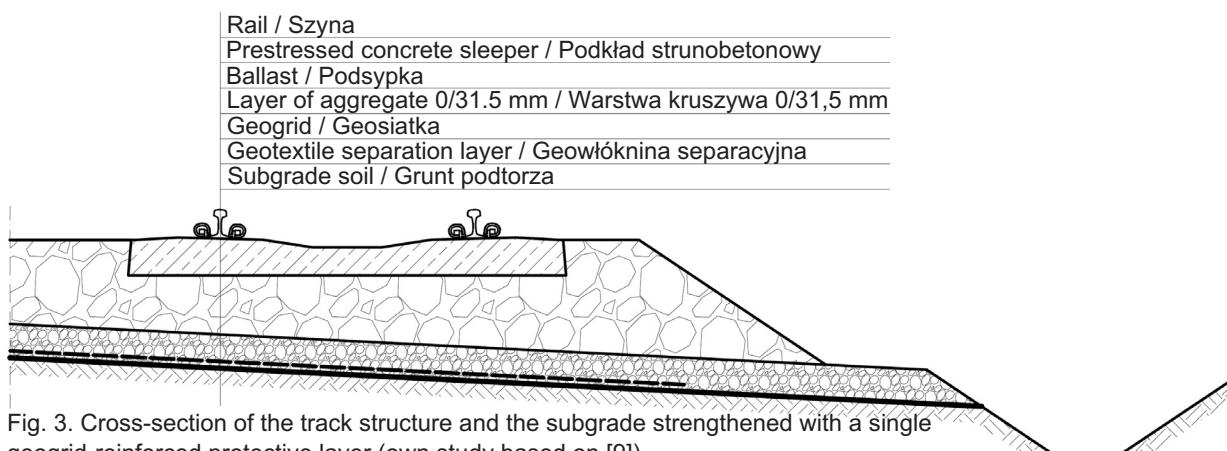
Cross-section of the track structure and the subgrade strengthened with a single geogrid-reinforced protective layer (own study based on [9])
